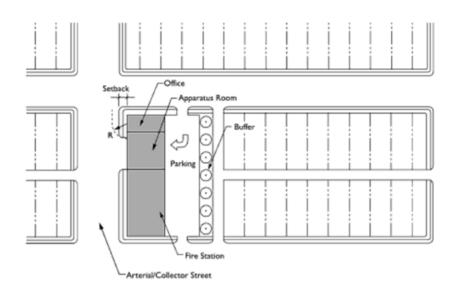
End Block Location, One-Storey Station (American Planning Association-APA, 2006, p. 206)
